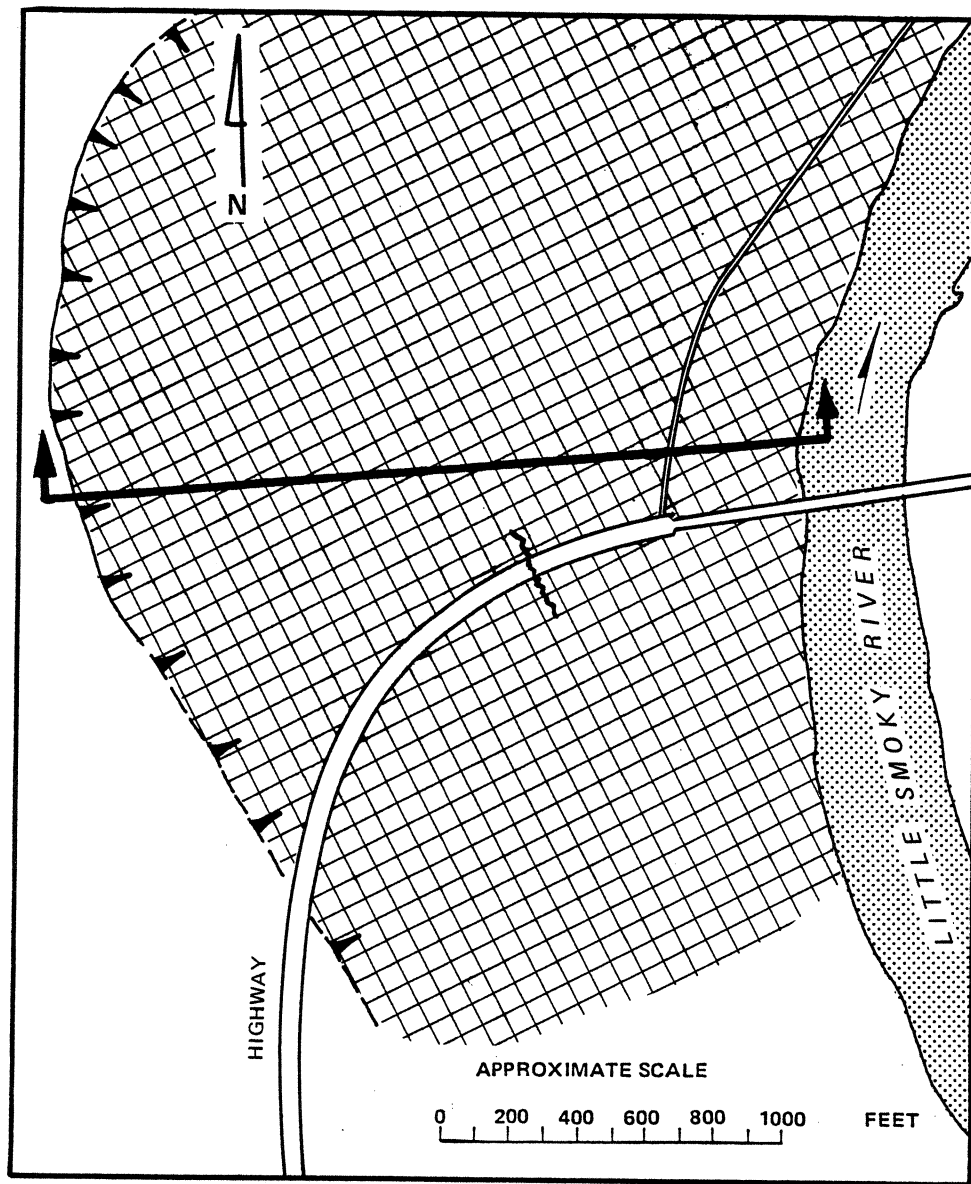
LITTLE SMOKY SLIDE AREA – SITE PLAN
